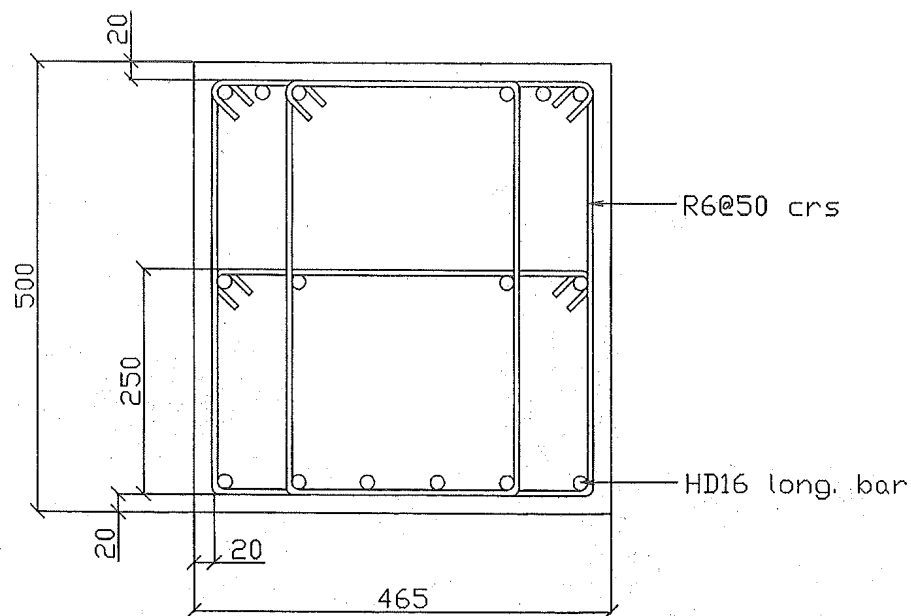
Design actions and reinforcement layout of foundation beam for Unit 1.
